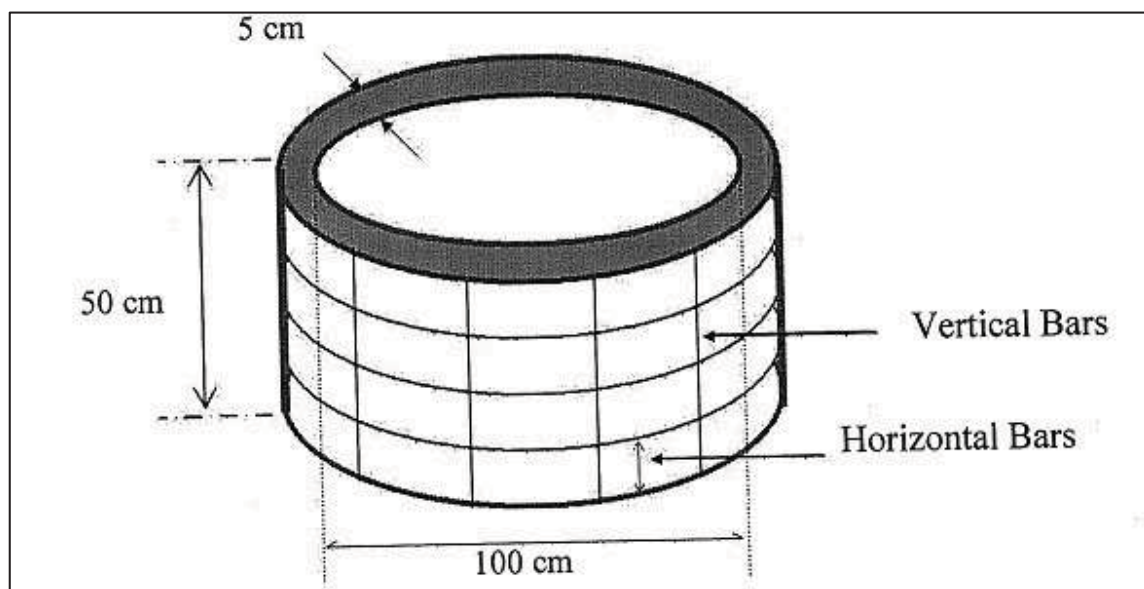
TECHNICAL SPECIFICATION AND REINFORCEMENT DETAILS OF PRECAST RCC CHAMBER – RINGS / COLLAR
